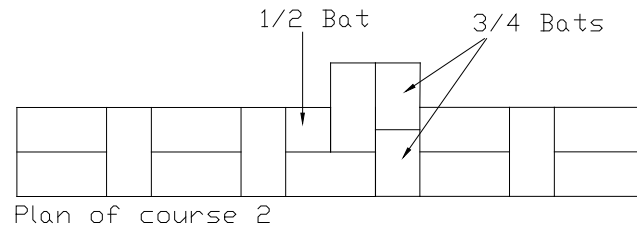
Flemish bond Attached Pier or pilaster (one brick thick)
